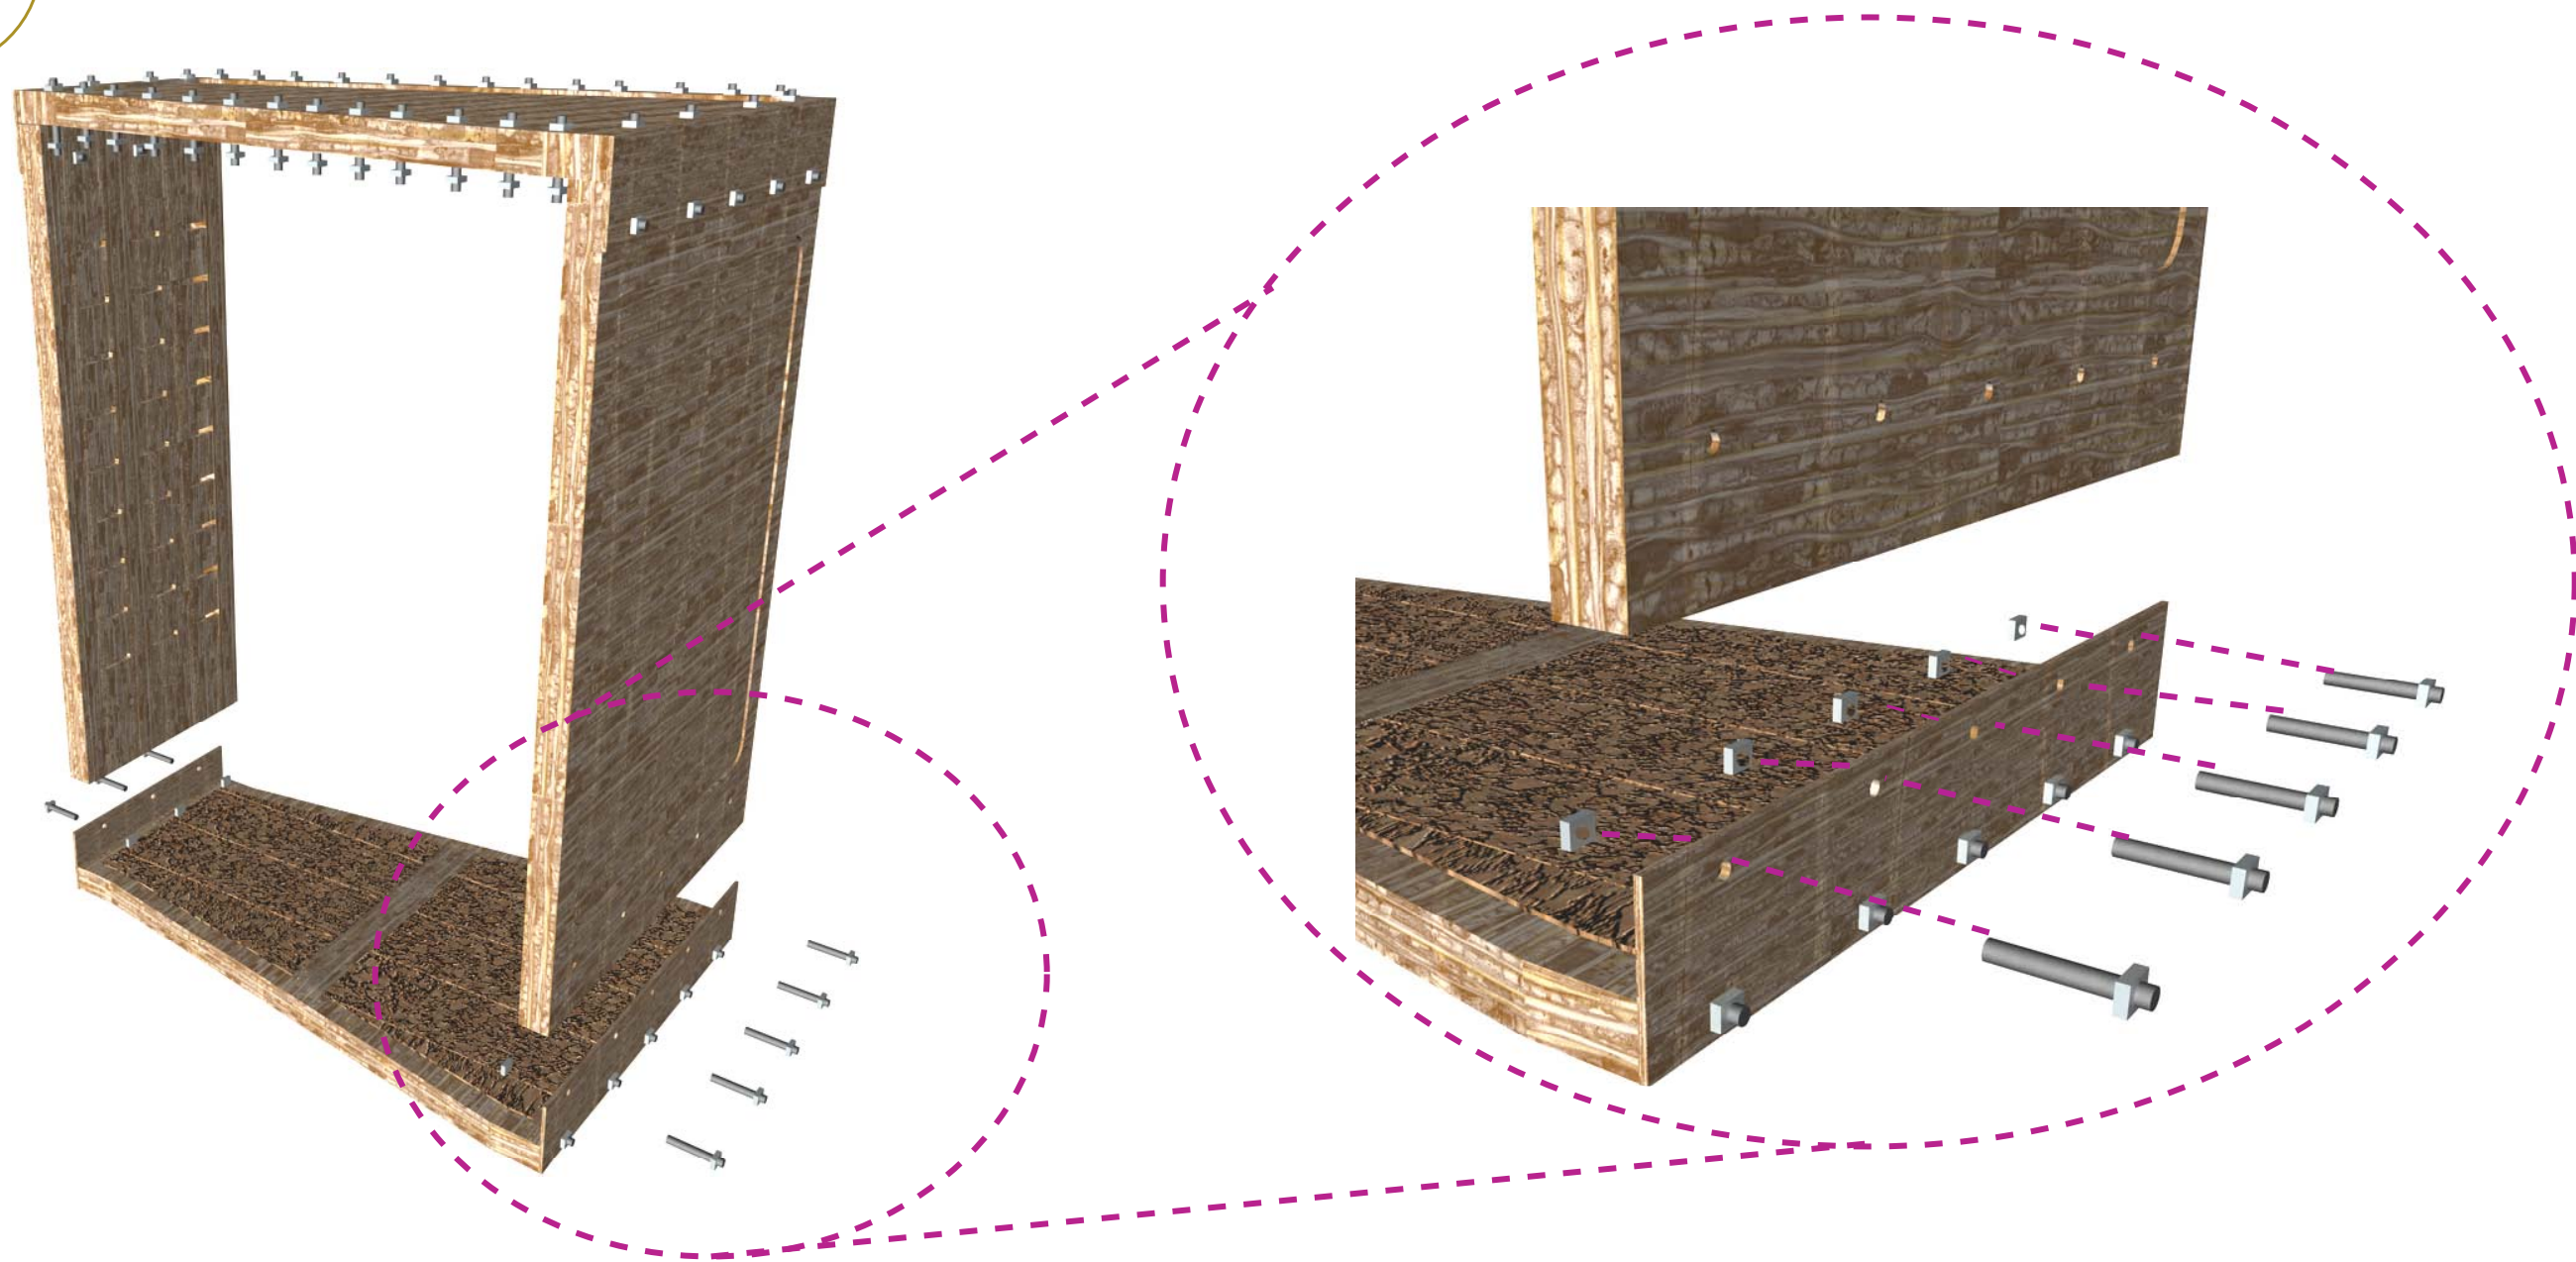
Module connection details.. (Sosa Fontaine, 2010).
